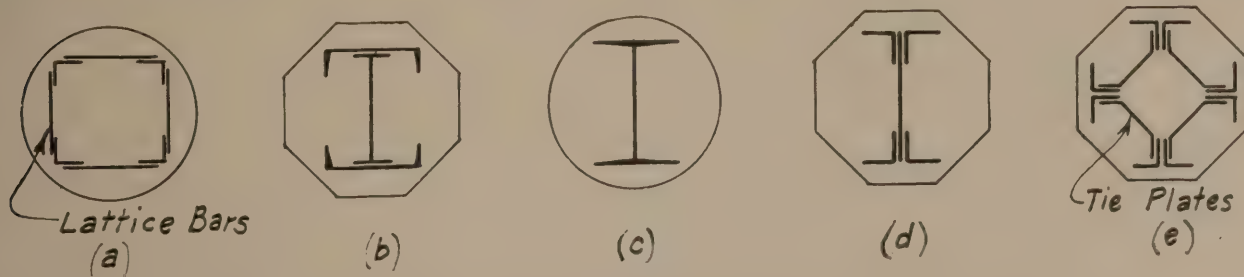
Sections Showing Types of Steel Cores Used in Composite Columns
